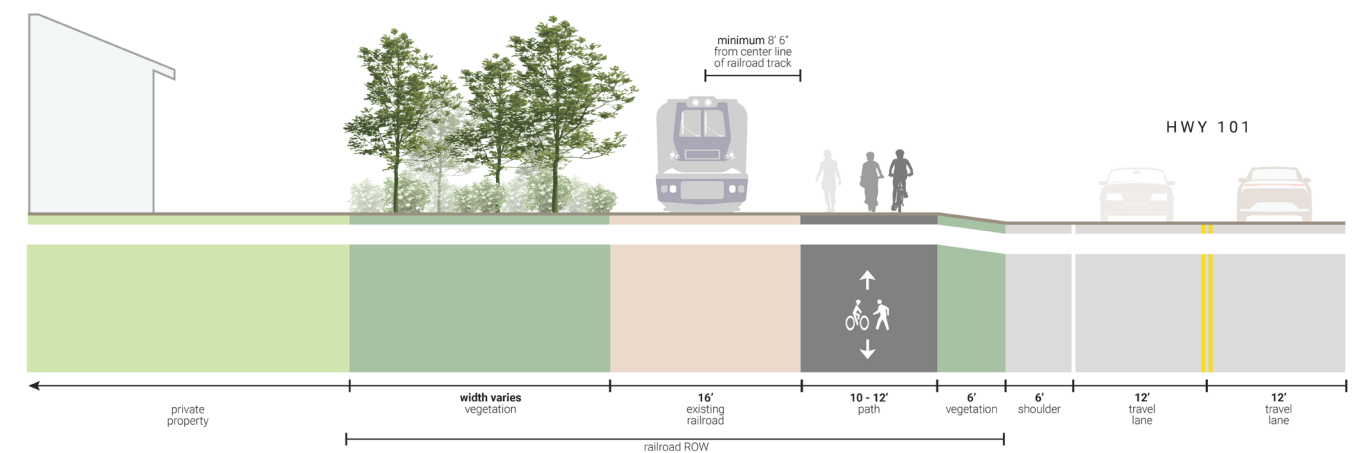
Option 2 from South 3rd Avenue to Washington Street showing the path on the east side of the tracks.
